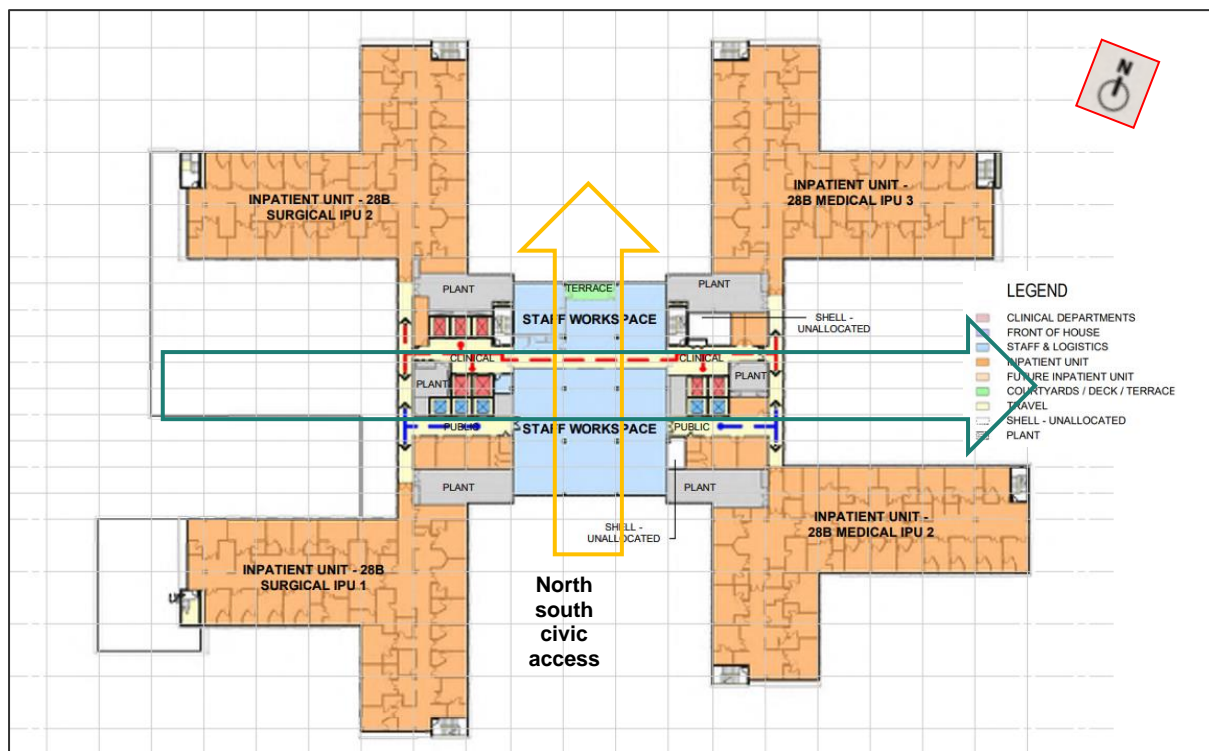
| Typical layout of an upper level (Level 4) identifying the two building axes (Source: Applicant's RTS)
